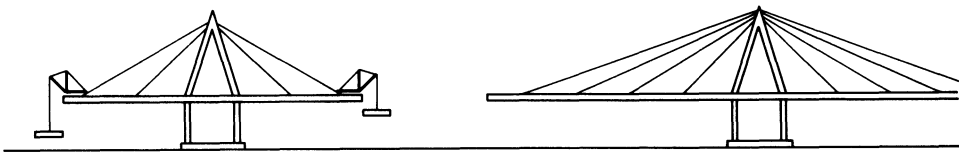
Erection of a multispan cable stayed bridge with triangular pylon structures.
